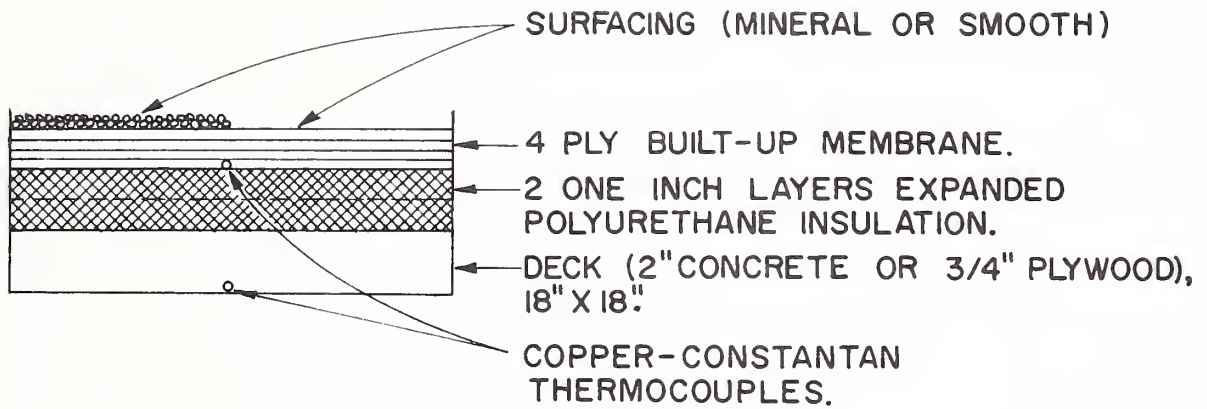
Schematic diagram of typical built-up roof specimens exposed outdoors.
